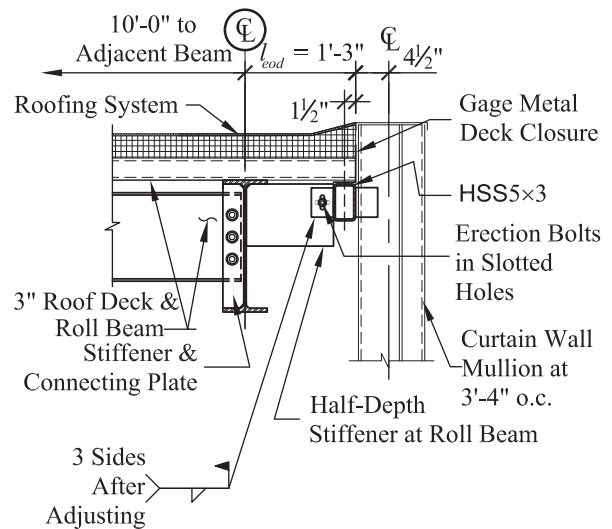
Section of roof spandrel beam with edge HSS and roll beams.
